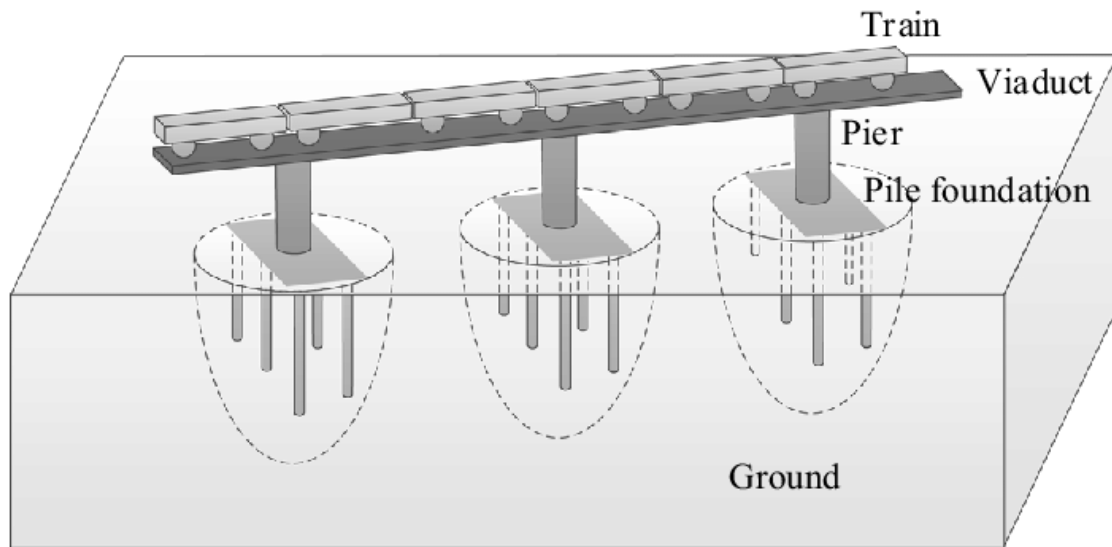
Pile foundations in bridges. (Source: Wu et al. (2002))
